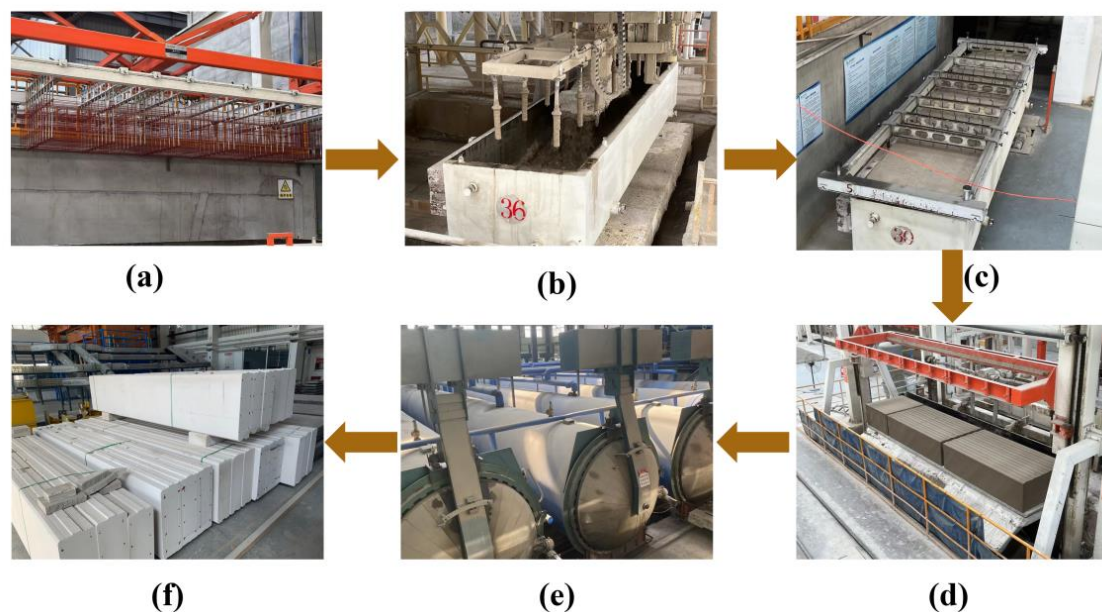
Images showing the production process of AAC wall panels: (a) tied rebar is coated with anti-corrosion solution; (b) concrete filling; (c) concrete setting; (d) concrete cutting; (e) concrete subjected to pressurized aeration; (f) formation of the AAC panel.
